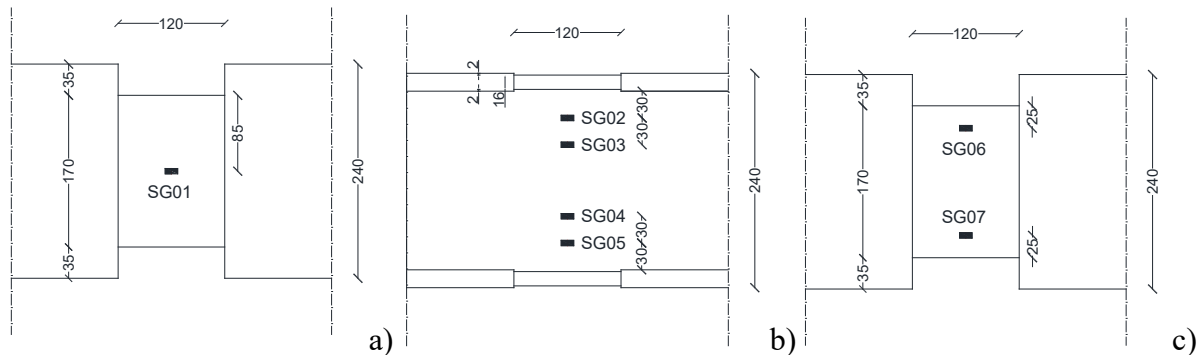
Arrangement of the strain gages: a) upper flange; b) web; c) lower flange.
